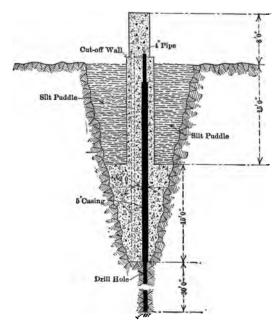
Grout Pipes in Cut-off Trench of Lahontan Dam. (Eng. Record, Vol. LXVII, p. 340.)
